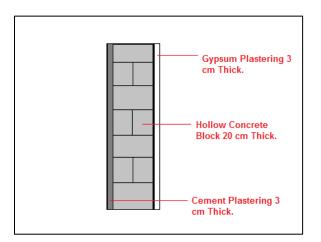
Section in exterior wall of Gullan & Harsham city houses (Kareim, 2018)
